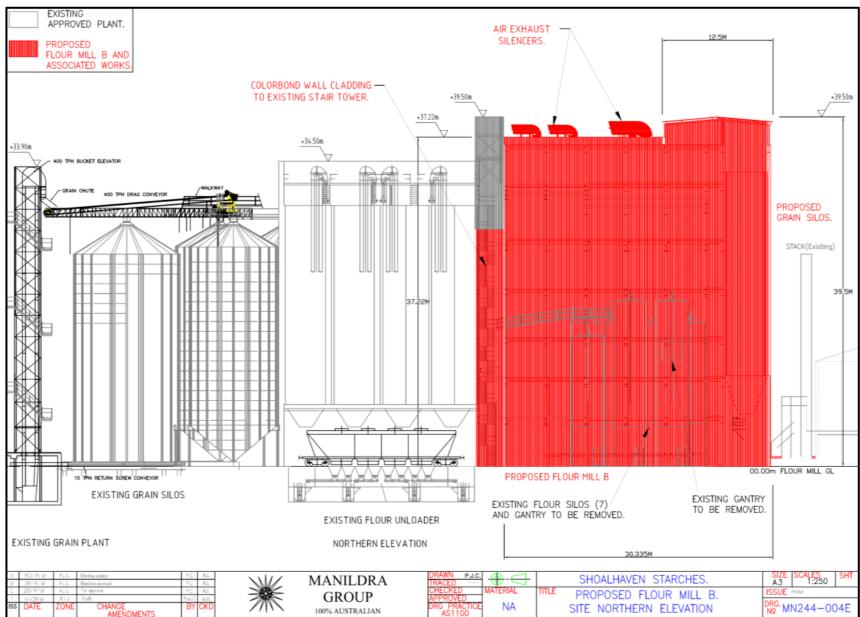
PROPOSED FLOUR MILL B NORTHERN ELEVATION DETAIL EXISTING APPROVED PLANT. PROPOSED FLOUR MILL B AND ASSOCIATED WORKS. +37.22m +34.50m 400 TPH BUCKET ELEVATOR PROPOSED GRAIN SILOS. STACK(Existing) 39 5M 00.00m FLOUR MILL GL 15 TPH RETURN SCREW CONVEYOR PROPOSED FLOUR MILL B EXISTING GRAIN SILOS SHOWING PLANT. EXISTING FLOUR UNLOADER EXISTING GRAIN PLANT NORTHERN ELEVATION MANILDRA SHOALHAVEN STARCHES. 1:250 PROPOSED FLOUR MILL B. GROUP
